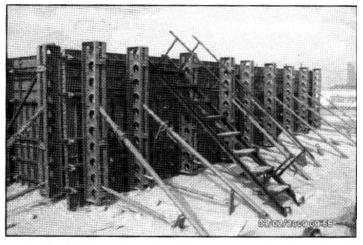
Pile-cap formwork (M/s RMD Kwikform type)
